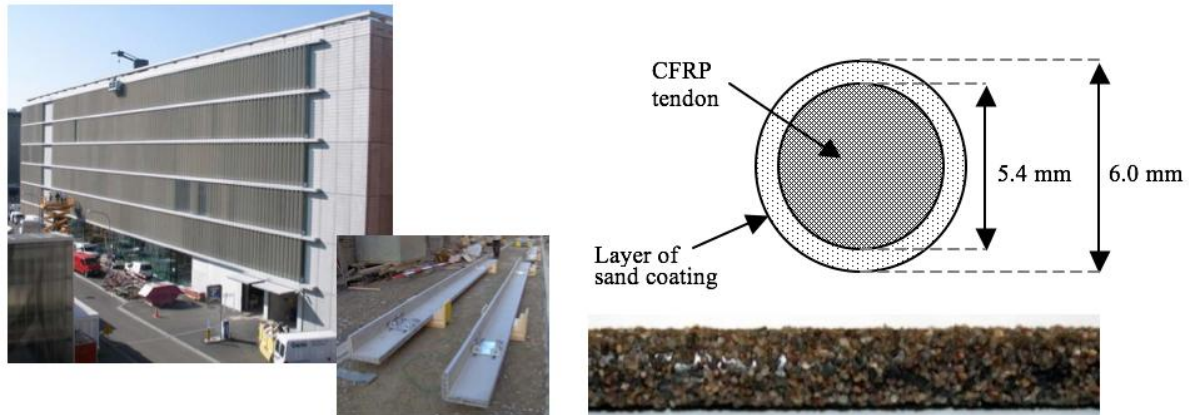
Application of CFRP prestressed concrete L-shaped beams for structural façade elements in Zurich, Switzerland (Terrasi, 2007), and cross section schematic/photo of the CFRP prestressing tendon used in the current study.
